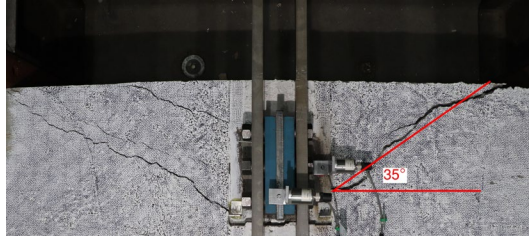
Typical concrete breakout cone for an anchorage loaded in shear towards a free edge (ST-215^B shown).
